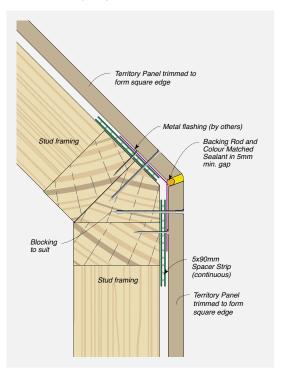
Obtuse Angle Corner Detail – With Metal Flashing and Colour Matched Sealant – Plan View
